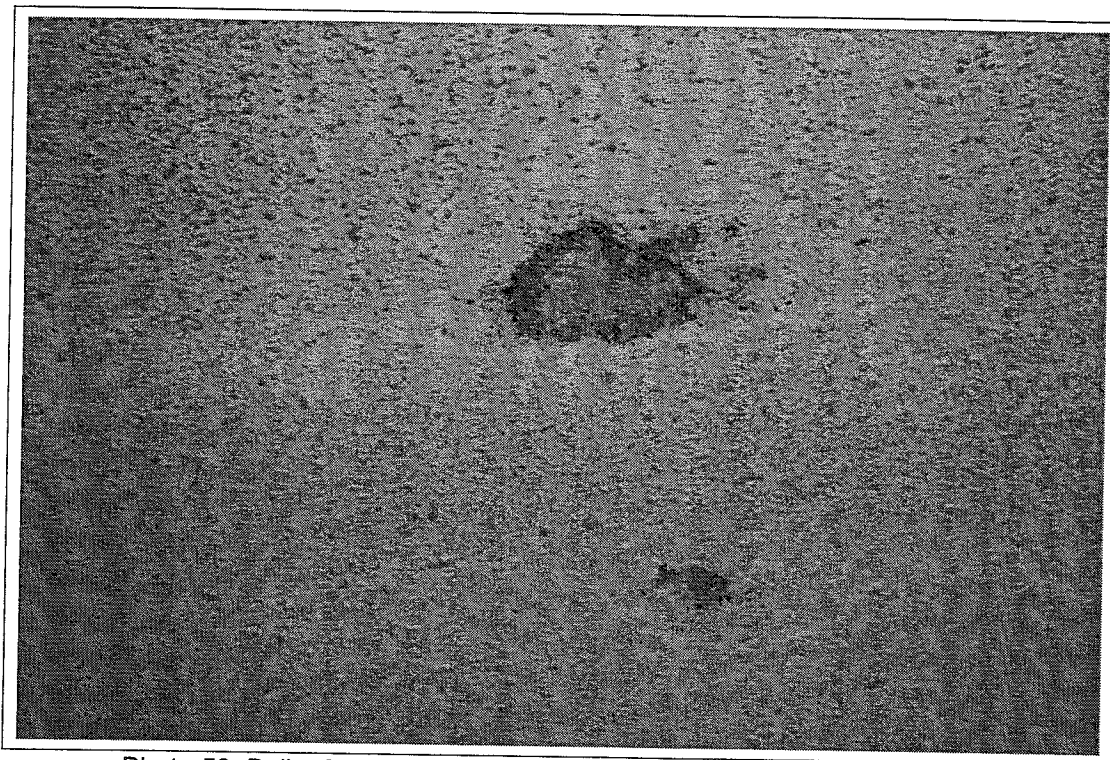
Boiler Room - Close-up of damaged acoustical plaster ceiling
